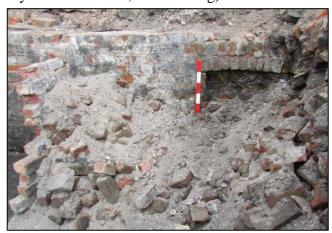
Partially exposed arch in wall (150) with wall (152) visible to the left. Looking east.
